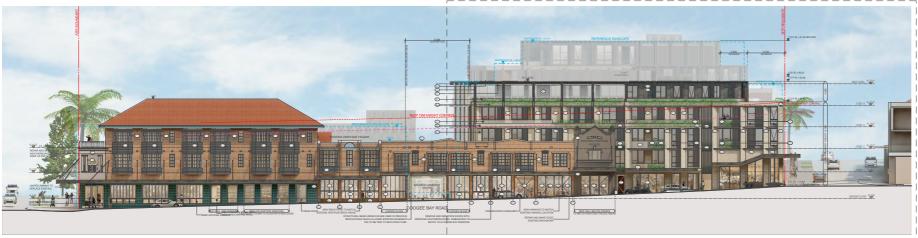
North Elevation Proposed Part 2 Fender Katsalidis
